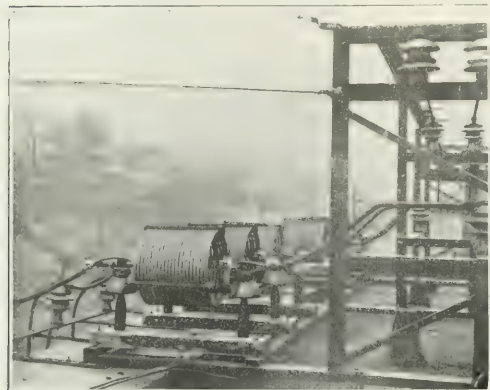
Structural Steel-Line Wire Supports and Choke Coil Mountings.
